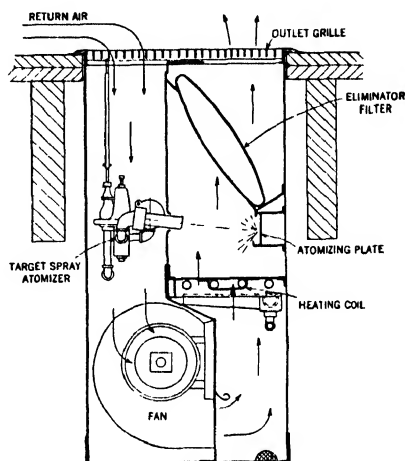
HUMIDIFYING UNIT FOR RADIATOR HEATED HOMES
